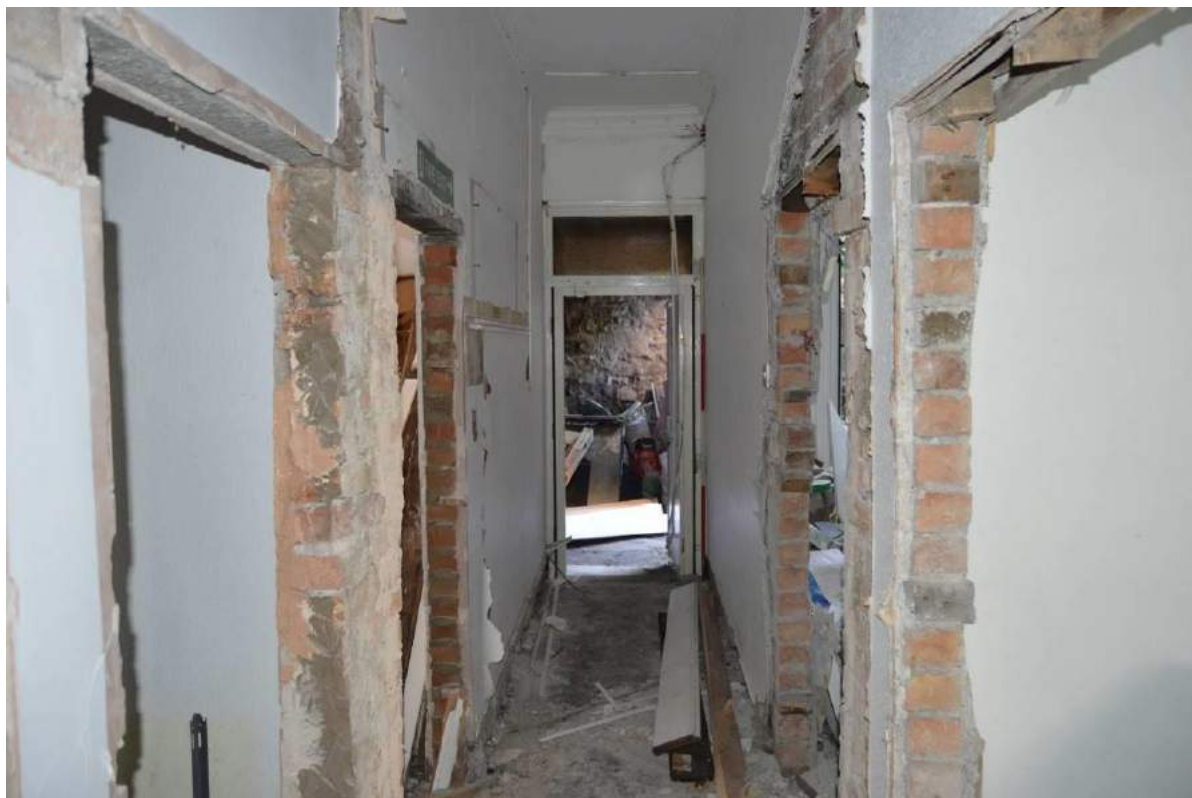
Hallway, looking towards the side entrance, south east (Scale: 1 x 2m).
